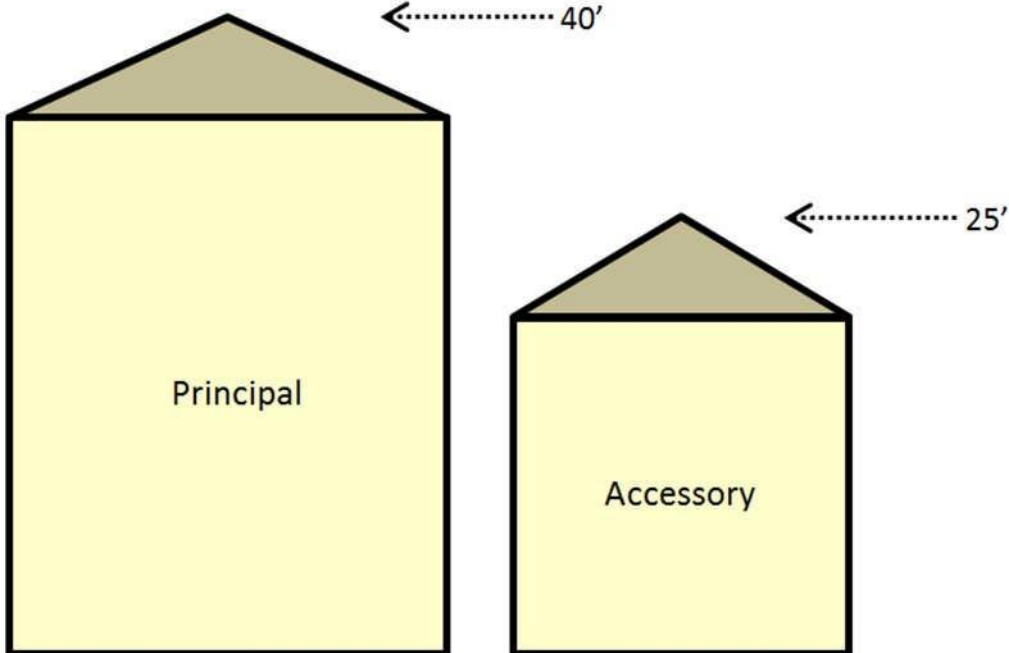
Typical WF Zoning District Building Height Example (Abutting Lots Not Developed) (Not Drawn to Scale)
